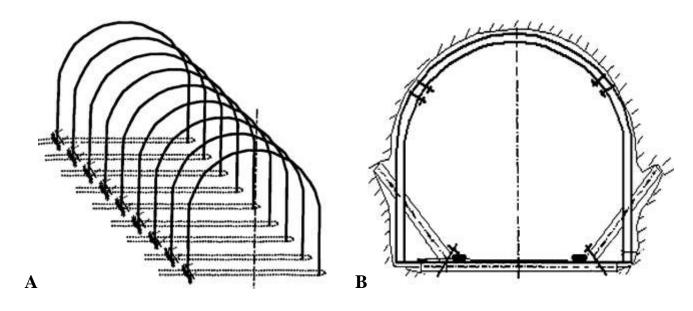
Schematic view construction: (A) arch legs join by flexible crosstie coupled cable ropes and (B) cross floor bars shoring on two upright between arch legs
